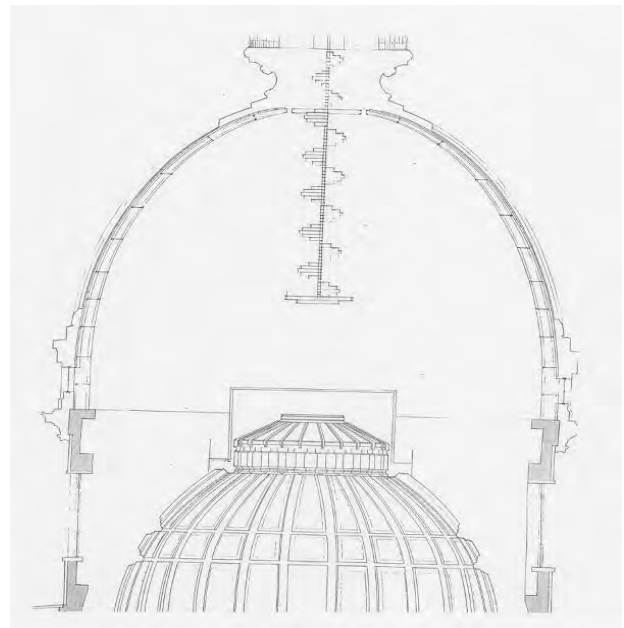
Sketch completed as part of the 1930s dome repair campaign, showing structure of inner and outer domes.
